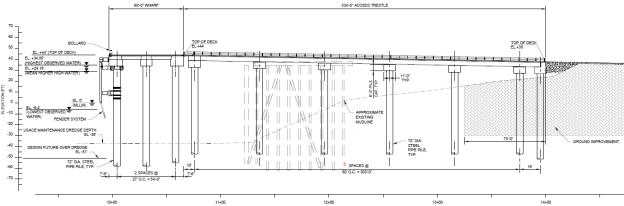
Longitudinal Elevation for T2 Access Trestles: Alternative 2A with 72-inch-diameter Driven Piles
